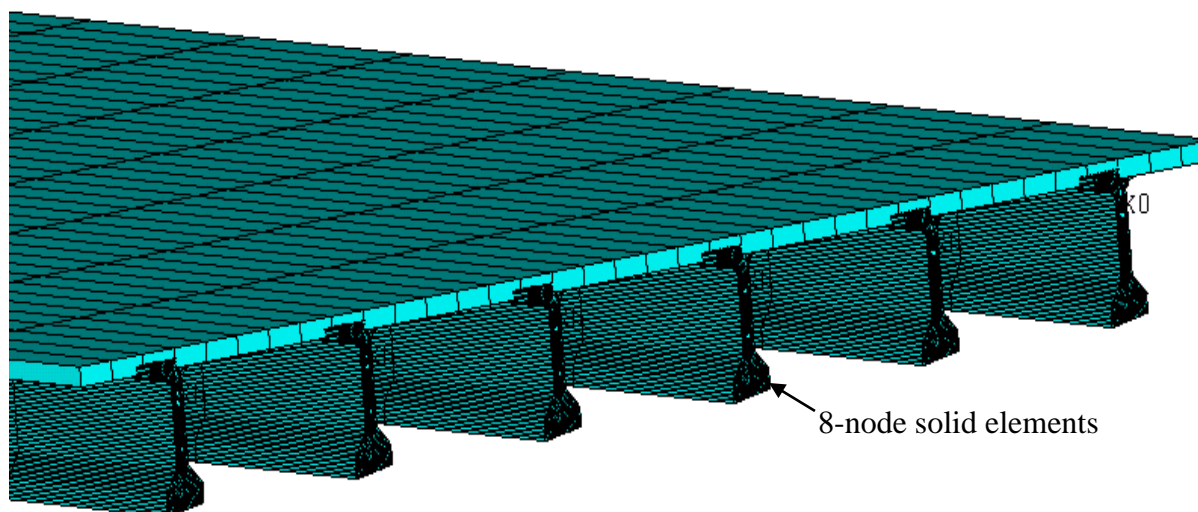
Isometric-section view of discretely modeled bridge deck and girders.
